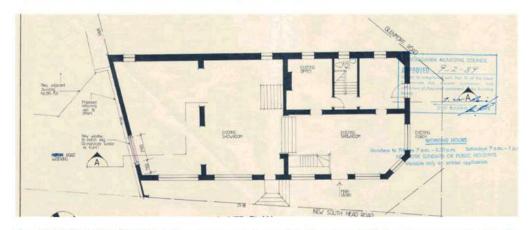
DA1988/1029 & BA1989/52 which approved a new window opening to the eastern wall. This floor plan most accurately reflects the current internal layout of the ground floor level.
